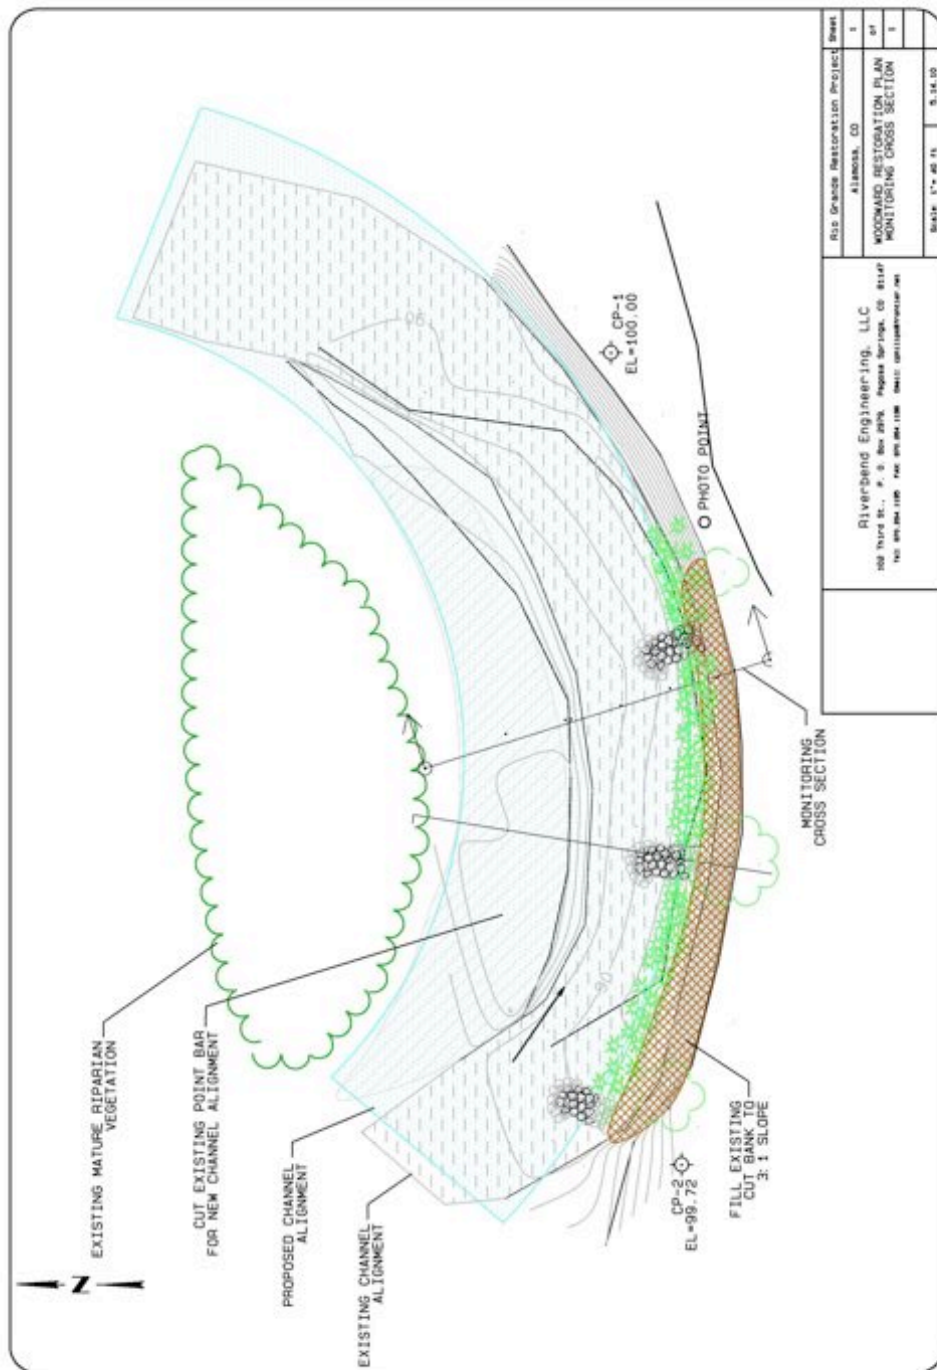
Woodard Site Design, Cross Section Location, and Photopoint Location.
